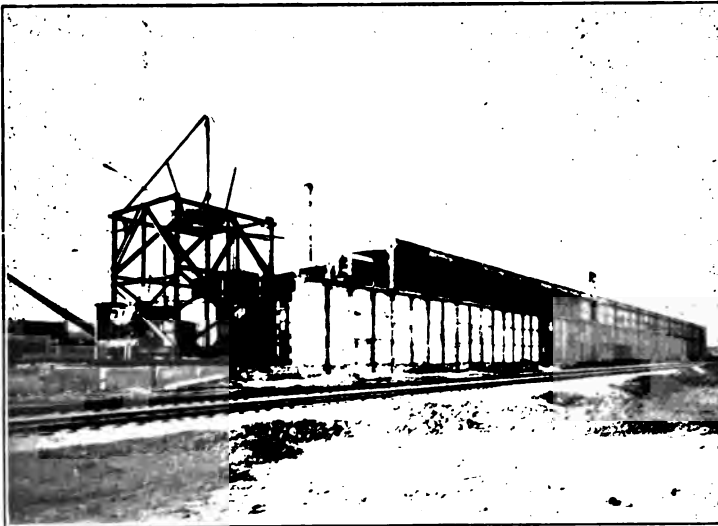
ERECTION OF CORRUGATING STACK HOUSE, ST. LOUIS, MO.
